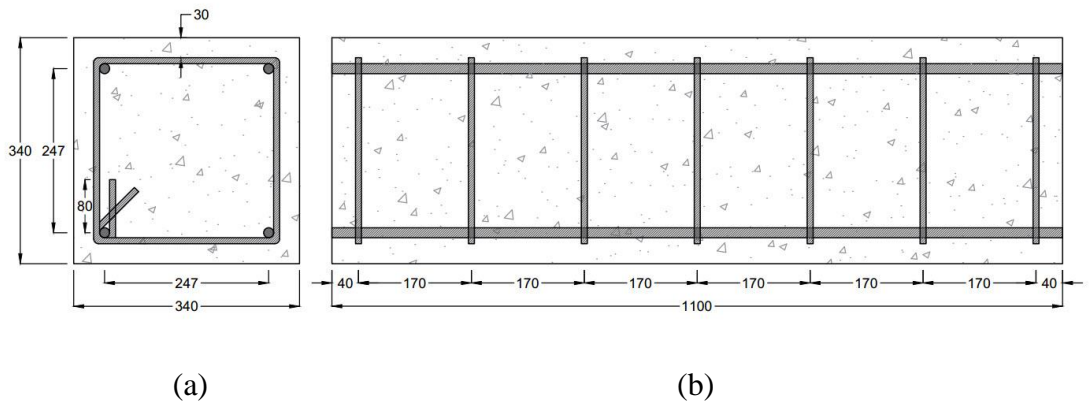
Reinforcement details of RC-170 column; (a) cross-section; and (b) longitudinal section (dimensions in mm).
